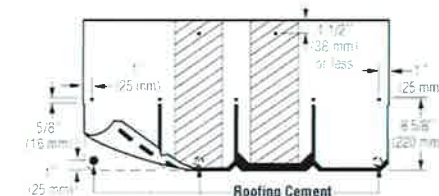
When installing Grand Manor Shingles on steep slopes, use seven nails and three spots of asphalt roofing cement.
